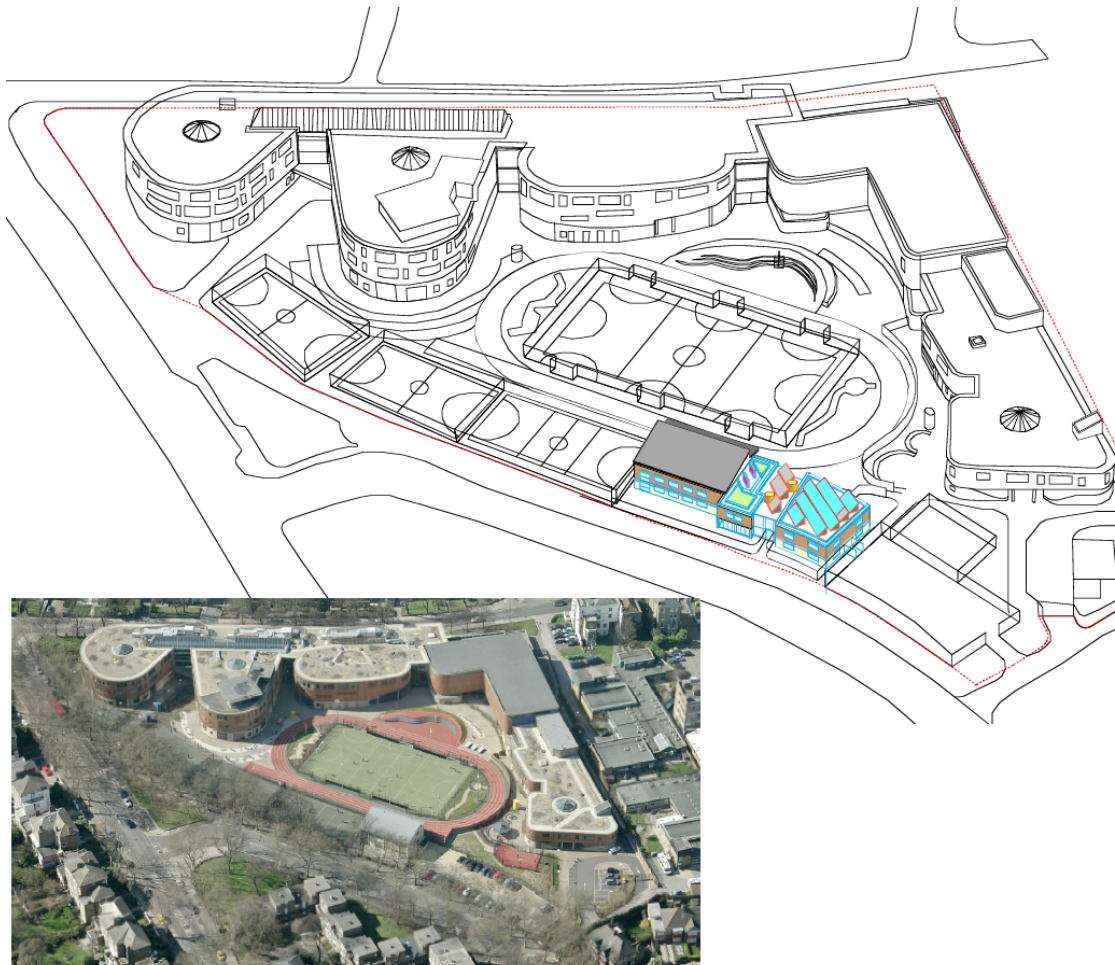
Aerial photograph and 3D visual drawing of existing site including the proposal
